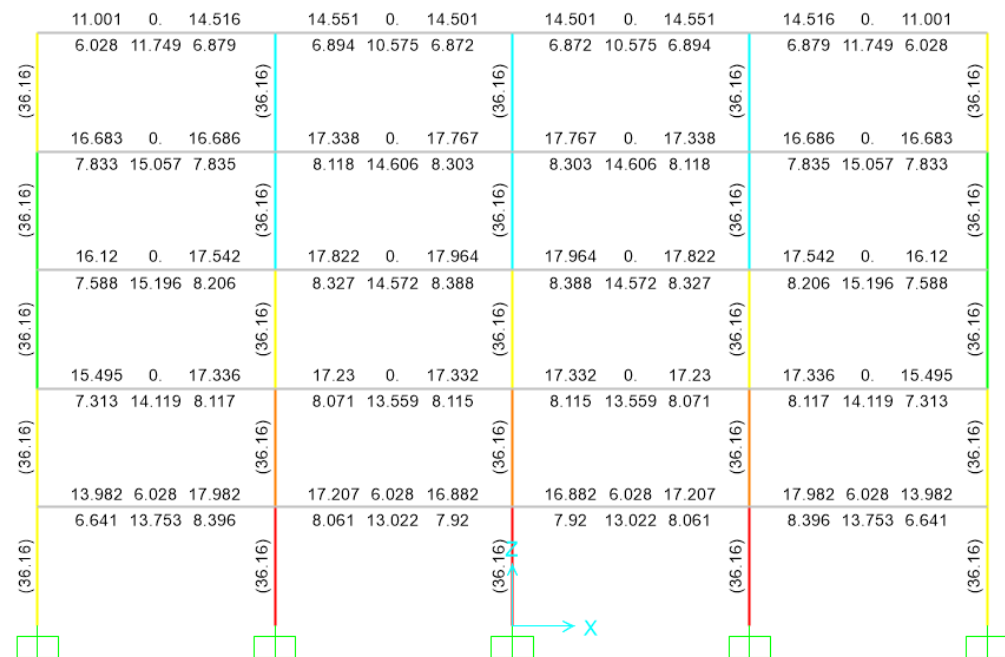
Check of demand/capacity ratio for columns in the central longitudinal frame.
